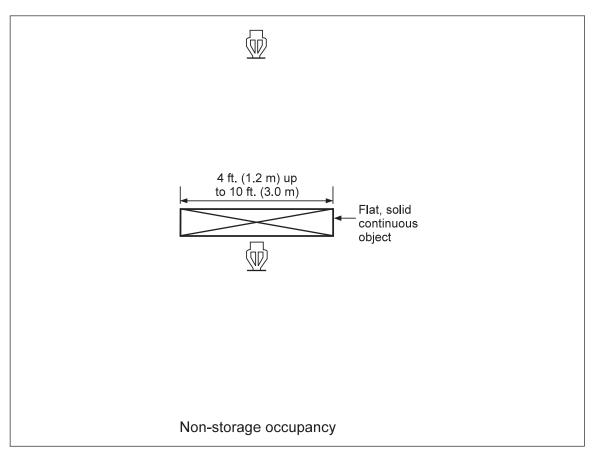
Additional sprinklers installed below flat, continuous, solid obstructions between 4 ft (1.2 m) and 10 ft (3.0 m) wide
